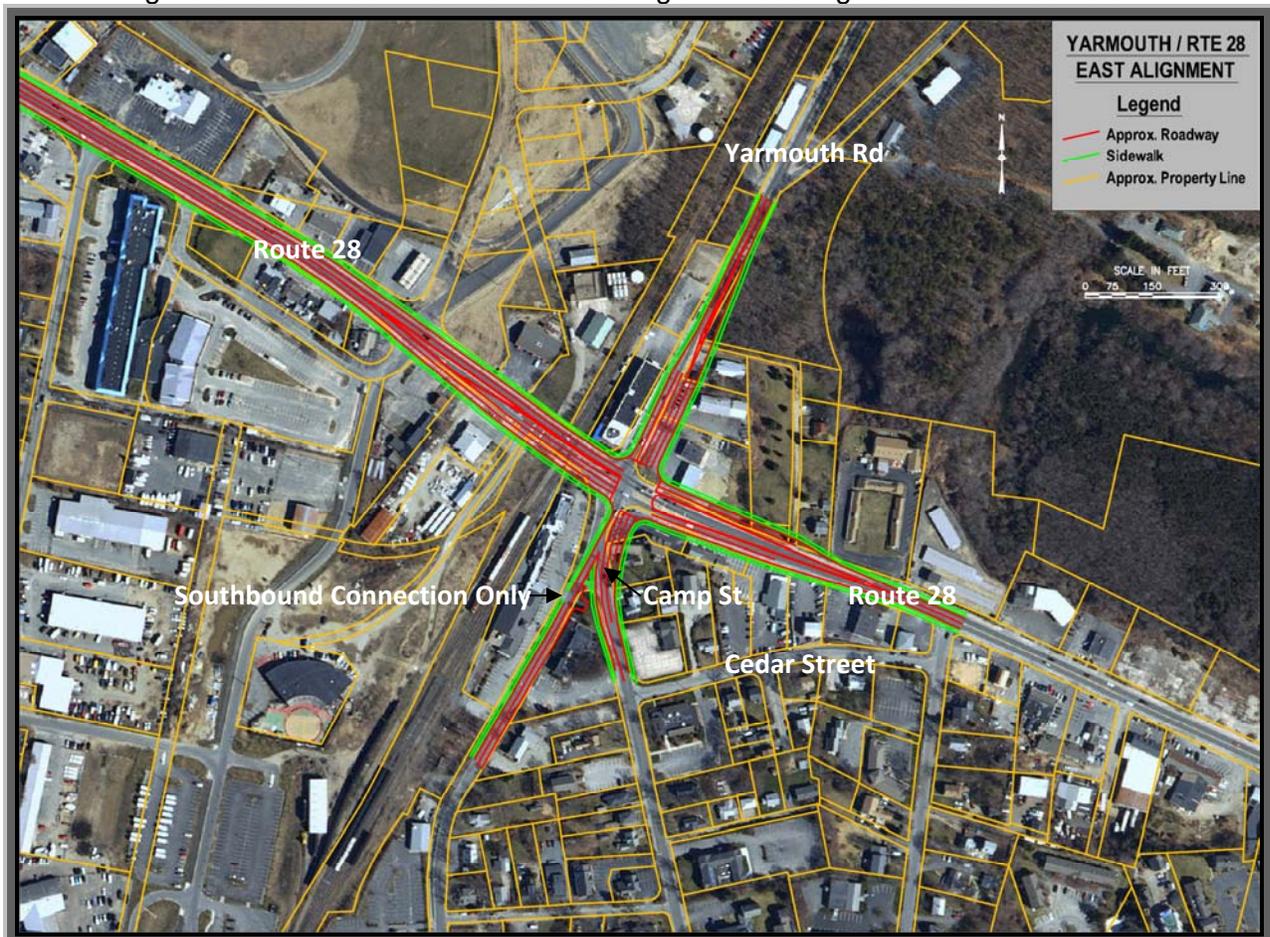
Yarmouth Road/Route 28 Intersection Improvements (East) Lanes
